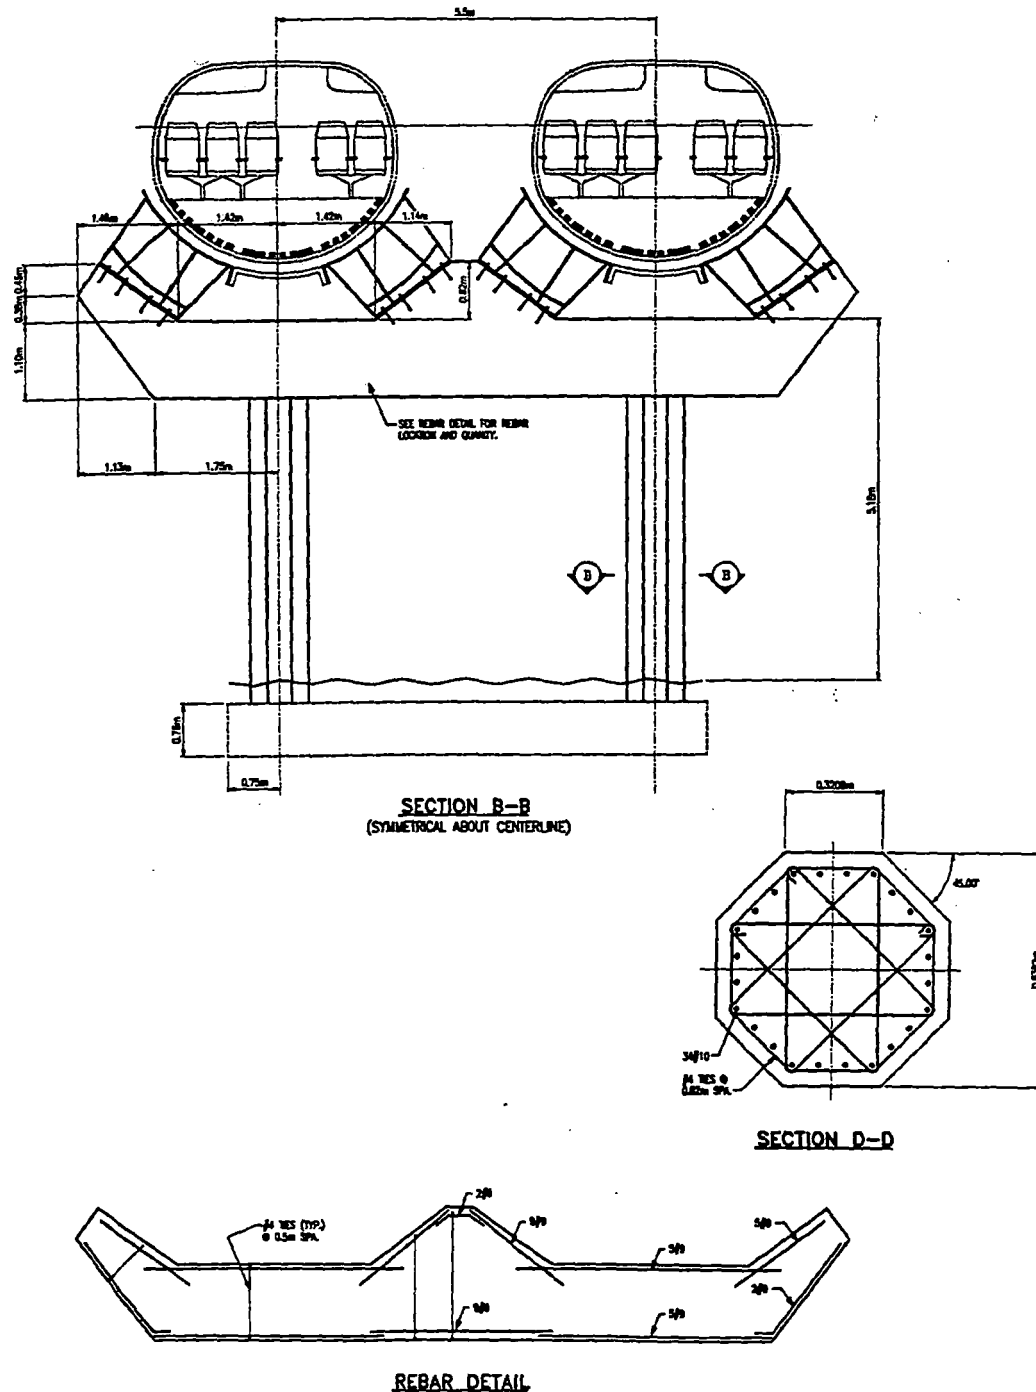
Concrete crossbeam and columns supporting an aluminum magway
